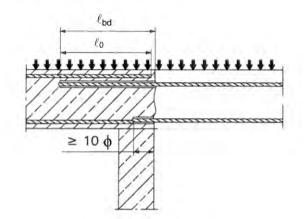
End anchoring of slabs or beams (e.g. designed as simply supported)
